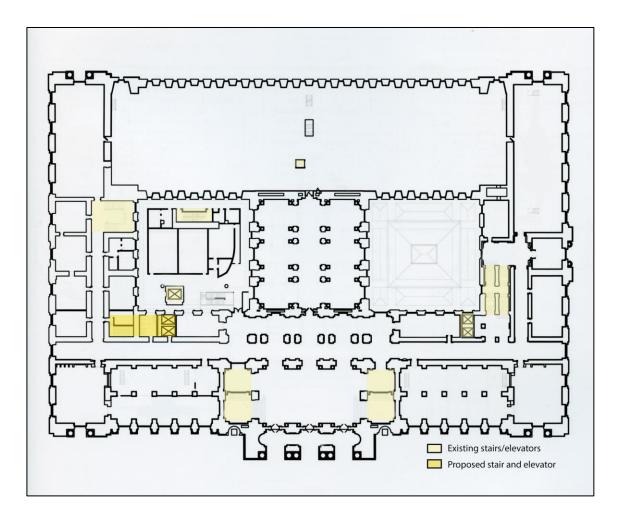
First floor plan showing existing and proposed major vertical circulation. <u>Three</u> stairways serve the south side (left) and one serves the north (right). Note: NYPL has not provided plans so this diagram is intended to represent what can be assumed from their vague presentation.
